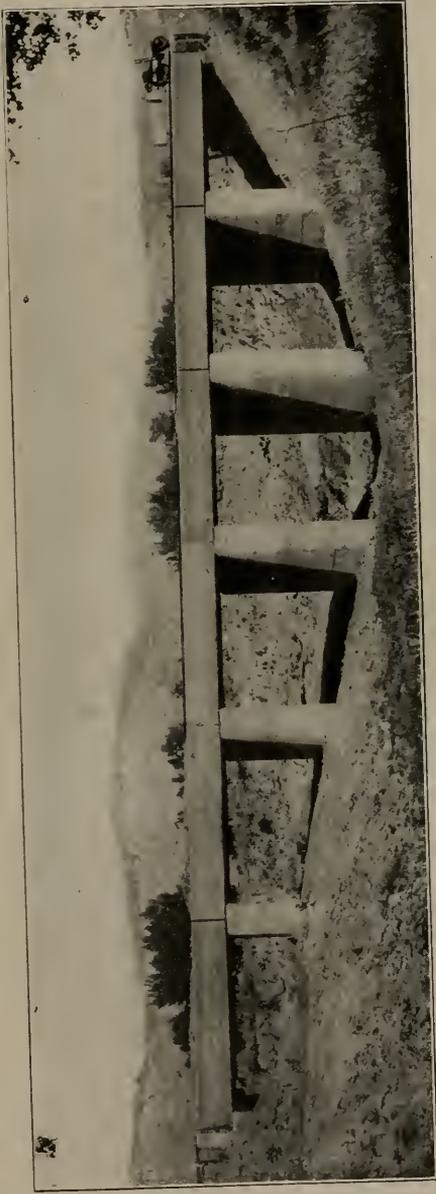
REINFORCED CONCRETE TRESTLE—NORTHERN PACIFIC RAILWAY.
